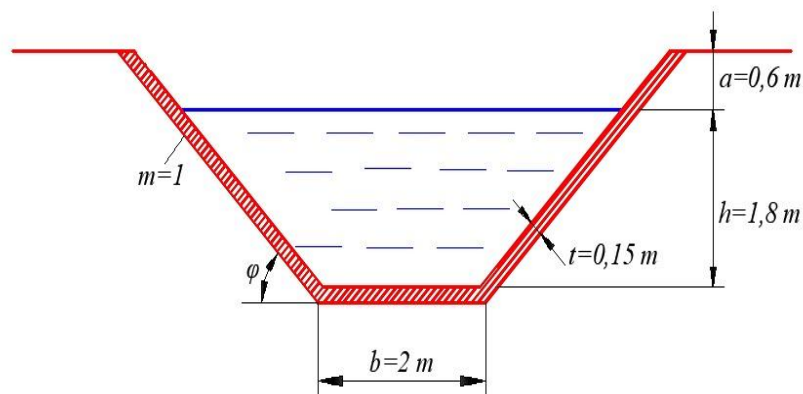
Cross-section of a concrete irrigation channel designed using the recommended method
